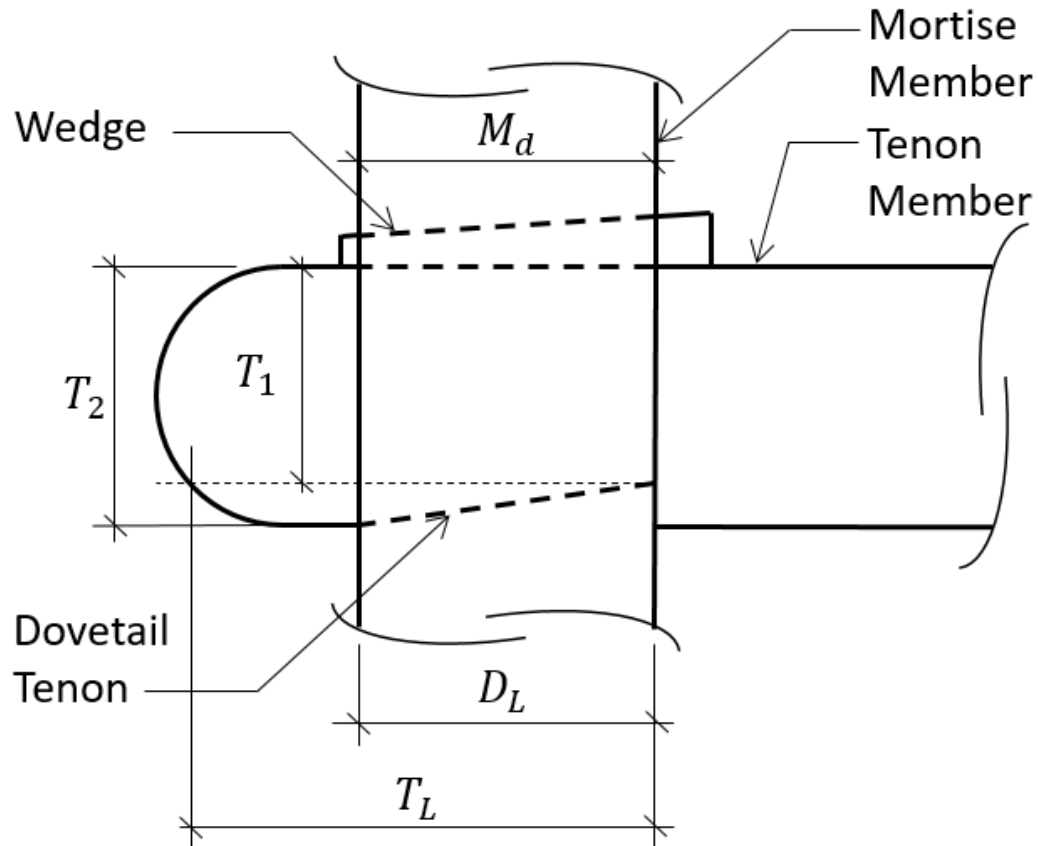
Wedged Dovetail Tenon Joint Dimensions
